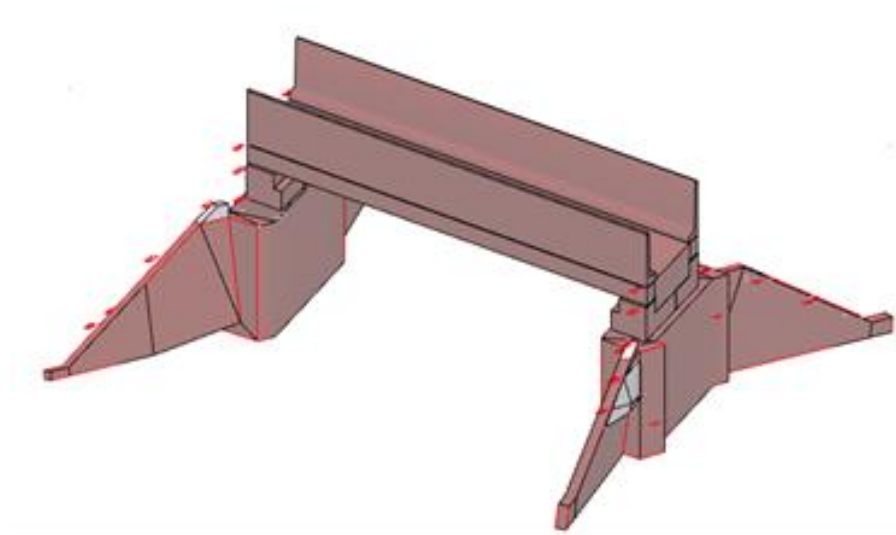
BIM model of the new narrow bridge deck and Victorian bridge bricks abutment.
